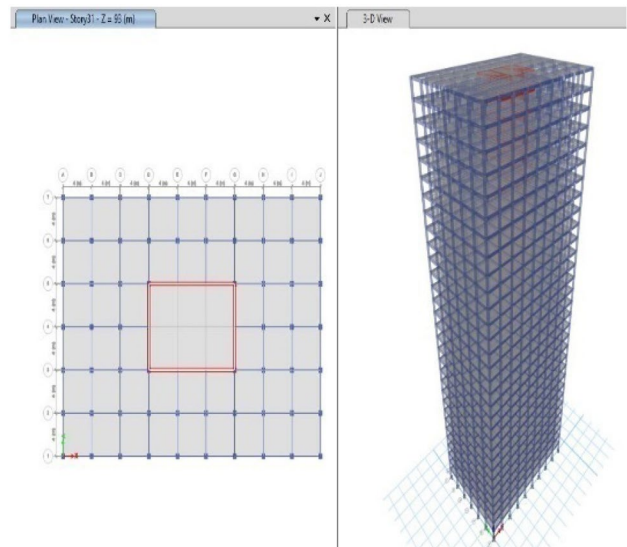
Model-6: Buildings with shear wall located at the centre as core
